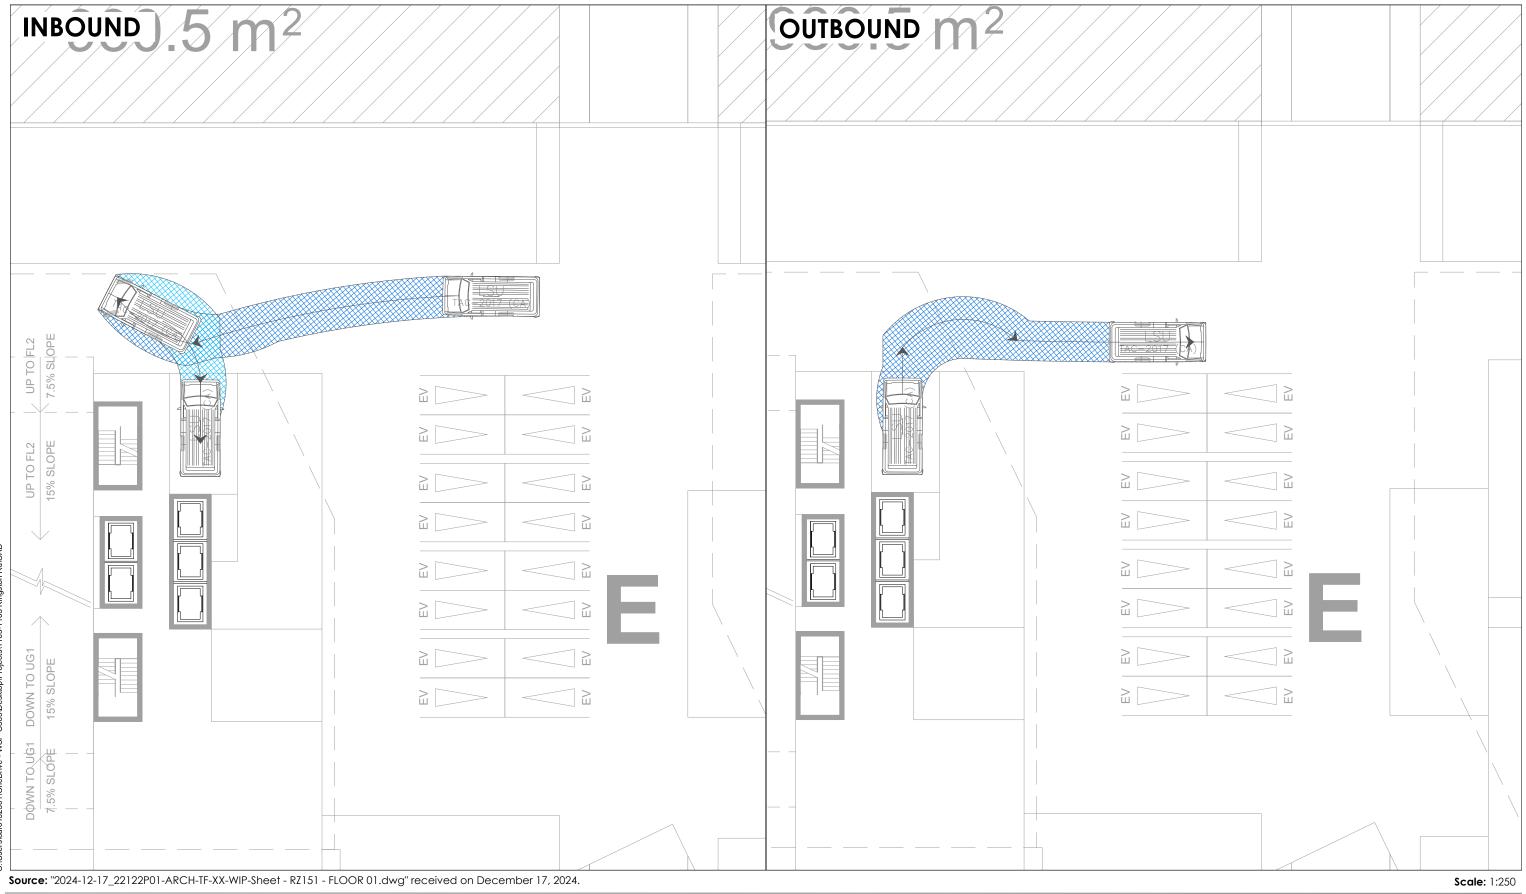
LSU Loading Truck Turning Maneuver - Building E - Loading Spaces 2 and 3 1105-1163 Kingston Road, Pickering
